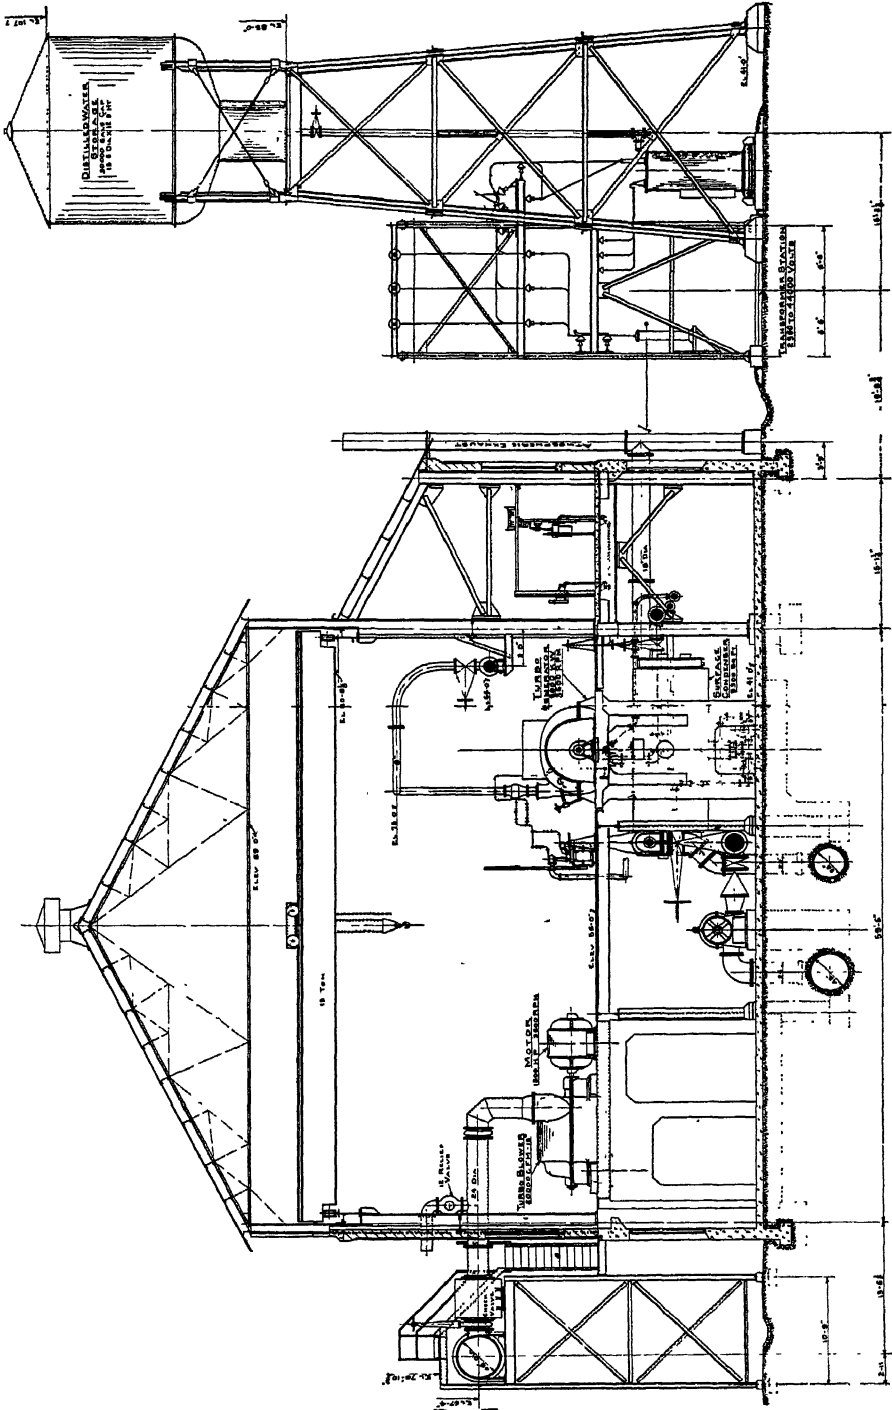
TYPICAL CROSS SECTION, NEW POWER PLANT.
